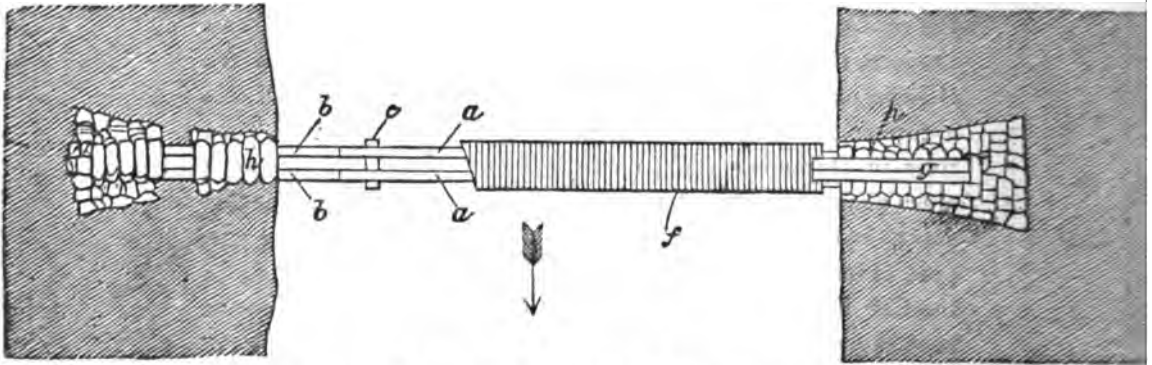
is a sectional elevation of a small temporary cantilever bridge thrown over the Tons river, about 3 miles above Thadiár. The wall plates under the arms (b, b) in the abutments have been omitted (Faunsar Forest Division).
